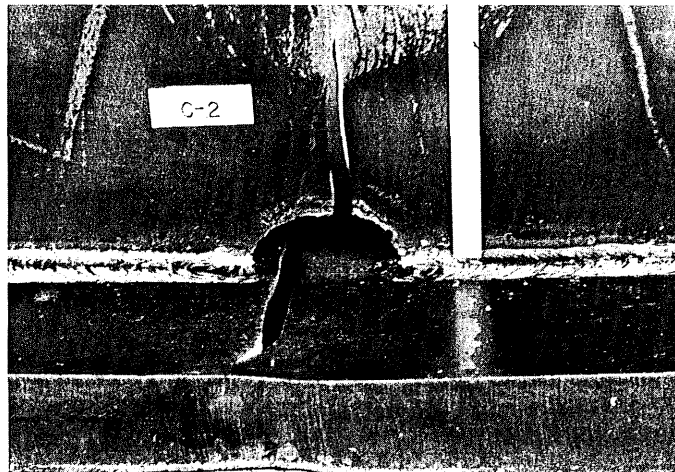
TYPICAL FATIGUE FRACTURES OF SPLICE TYPE "E"
